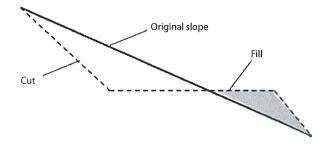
Cut-and-fill road construction design. Source: Kramer 2001.
